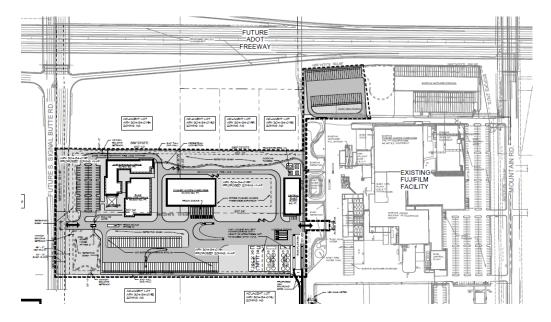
Master Site Plan for West 20 Acres & Northern 2.5 Acres
